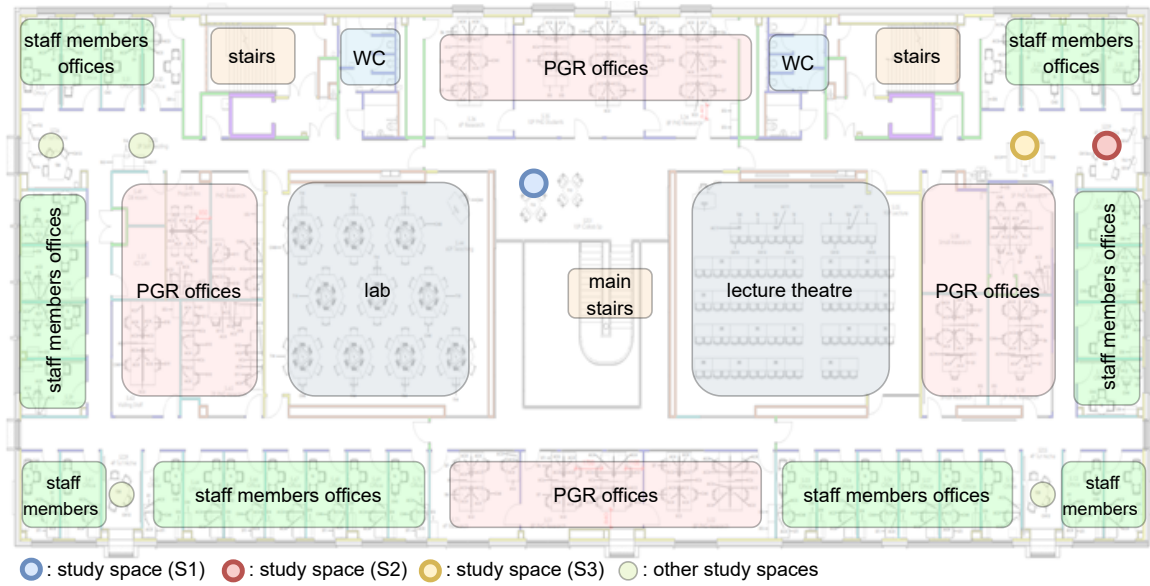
The floor plan of the fifth floor of the building with selected study spaces.
